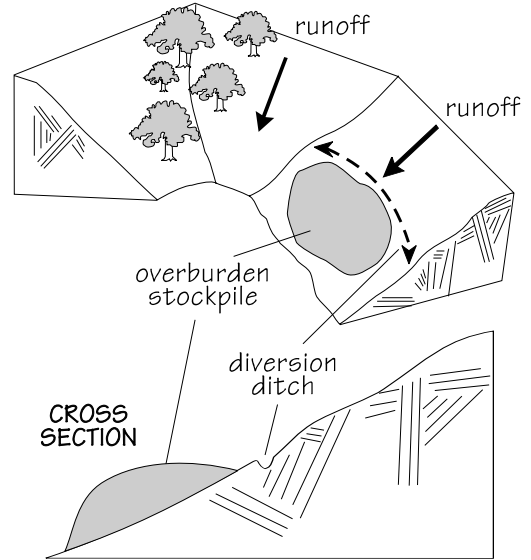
A diversion ditch can be placed upslope from an overburden pile to prevent saturation of the pile.
